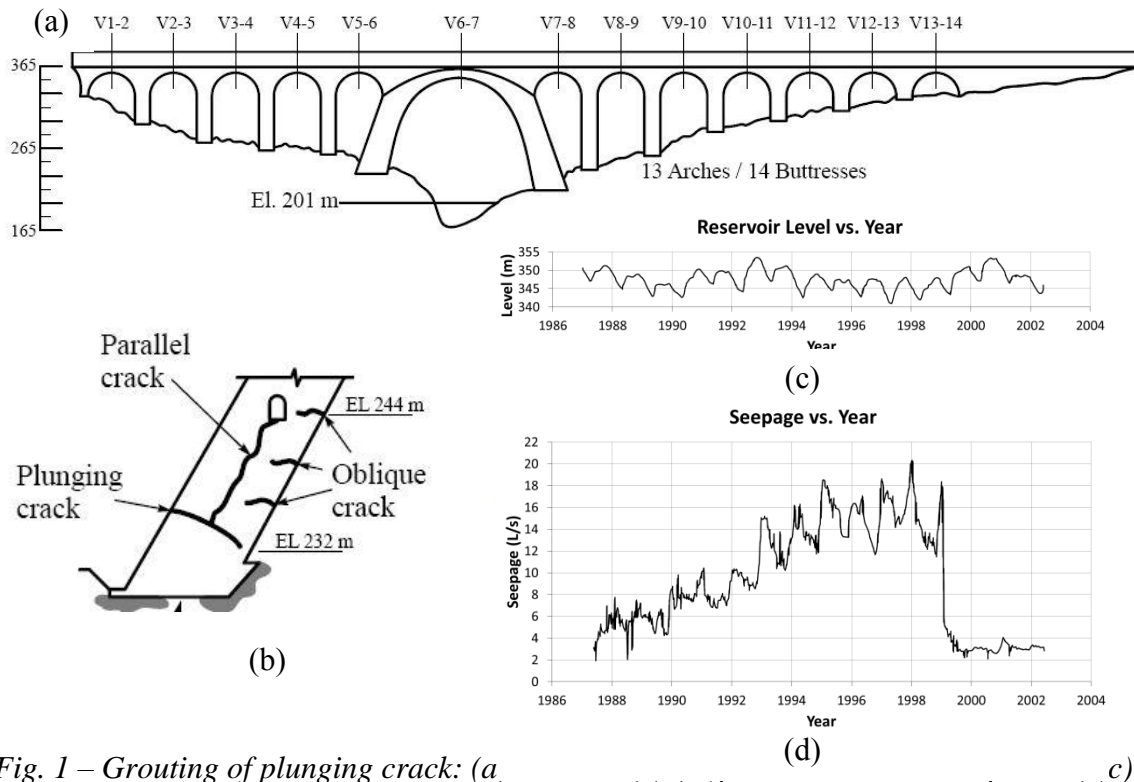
Grouting of plunging crack: (a) BDJ dam, (b) typical concrete crack pattern, (c) reservoir level, (d) seepage Arch 5-6
